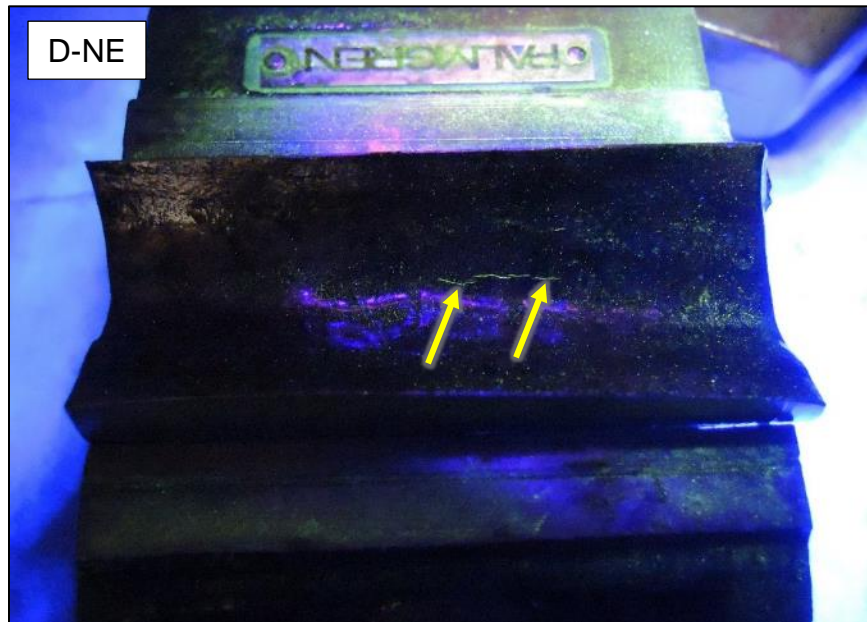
Representative image of the flange weld access hole surface of core sample D-NE following wet fluorescent magnetic particle testing showing cracks (arrows).
